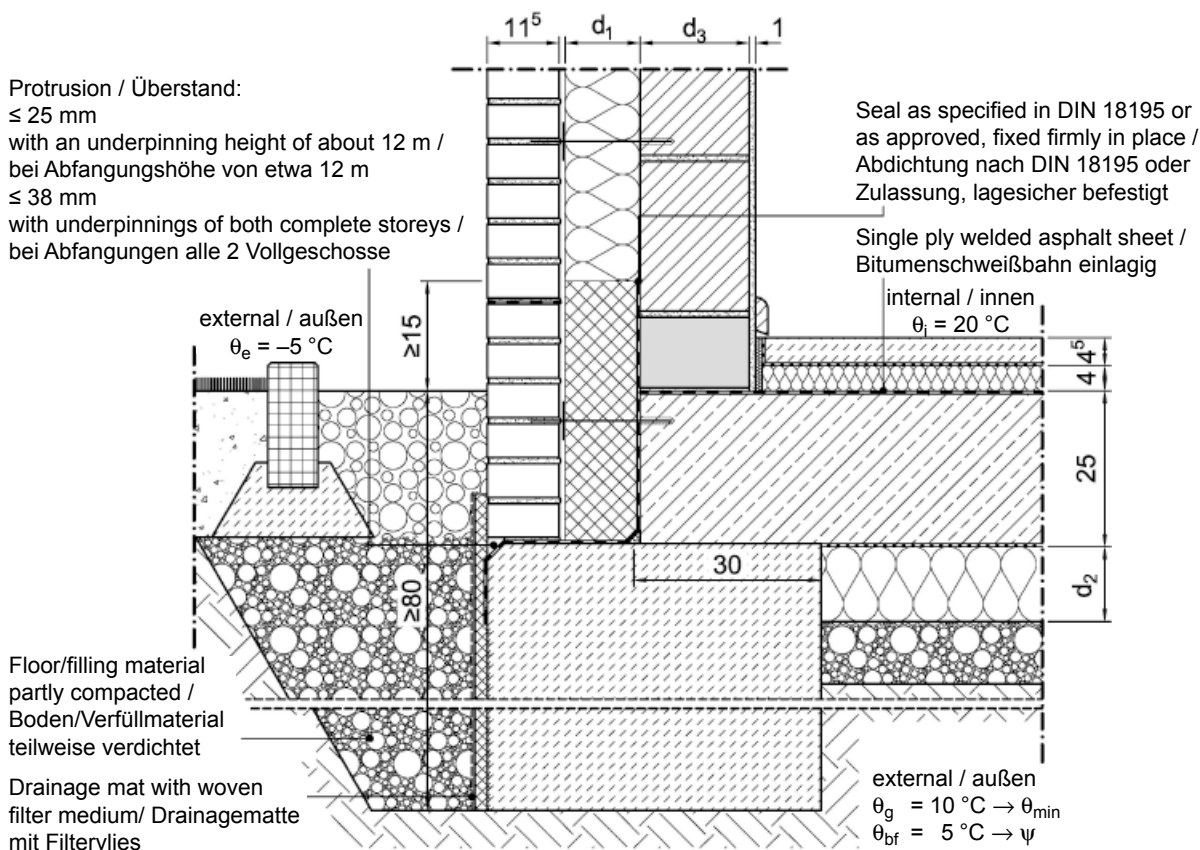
Base detail for cavity walls with facing masonry as specified in DIN EN 1996-2/NA (source: www.ziegelindustrie.de)
